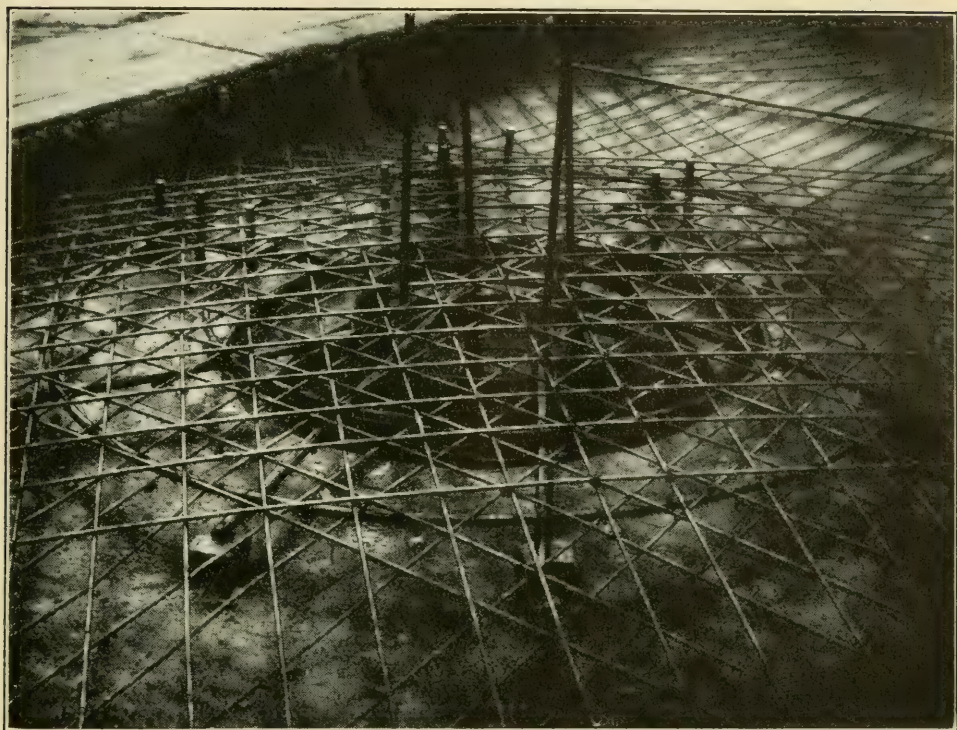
SLAB REINFORCEMENT, NORTHWESTERN GLASS COMPANY BUILDING, MINNEAPOLIS.
